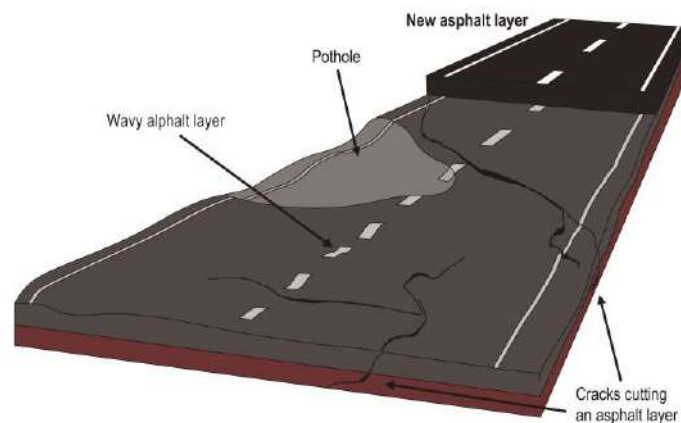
Schematic illustration showing the typical damages of a deformed road pavement and the resurfacing process (modified from Moreno-Sánchez 2020).
